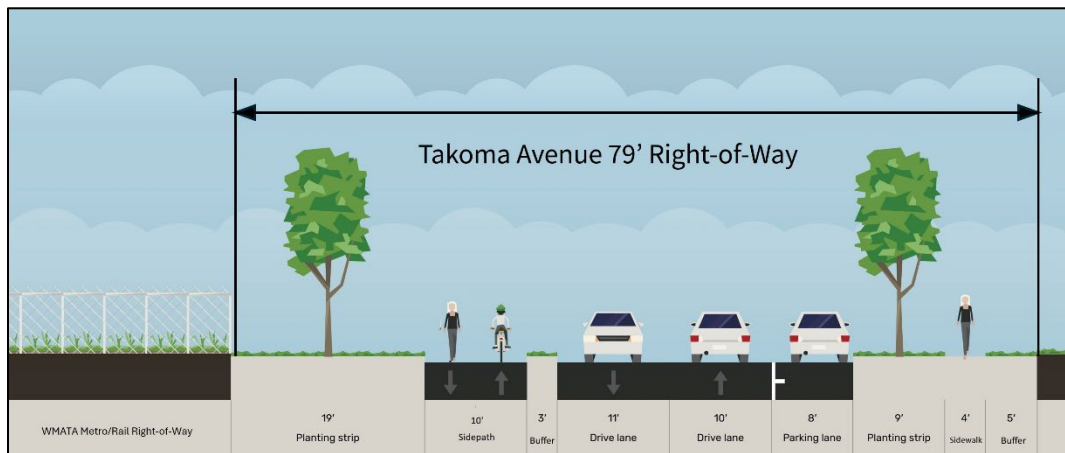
Existing Cross Section - Takoma Avenue from Buffalo Avenue to DC Line (Station 53+00)
